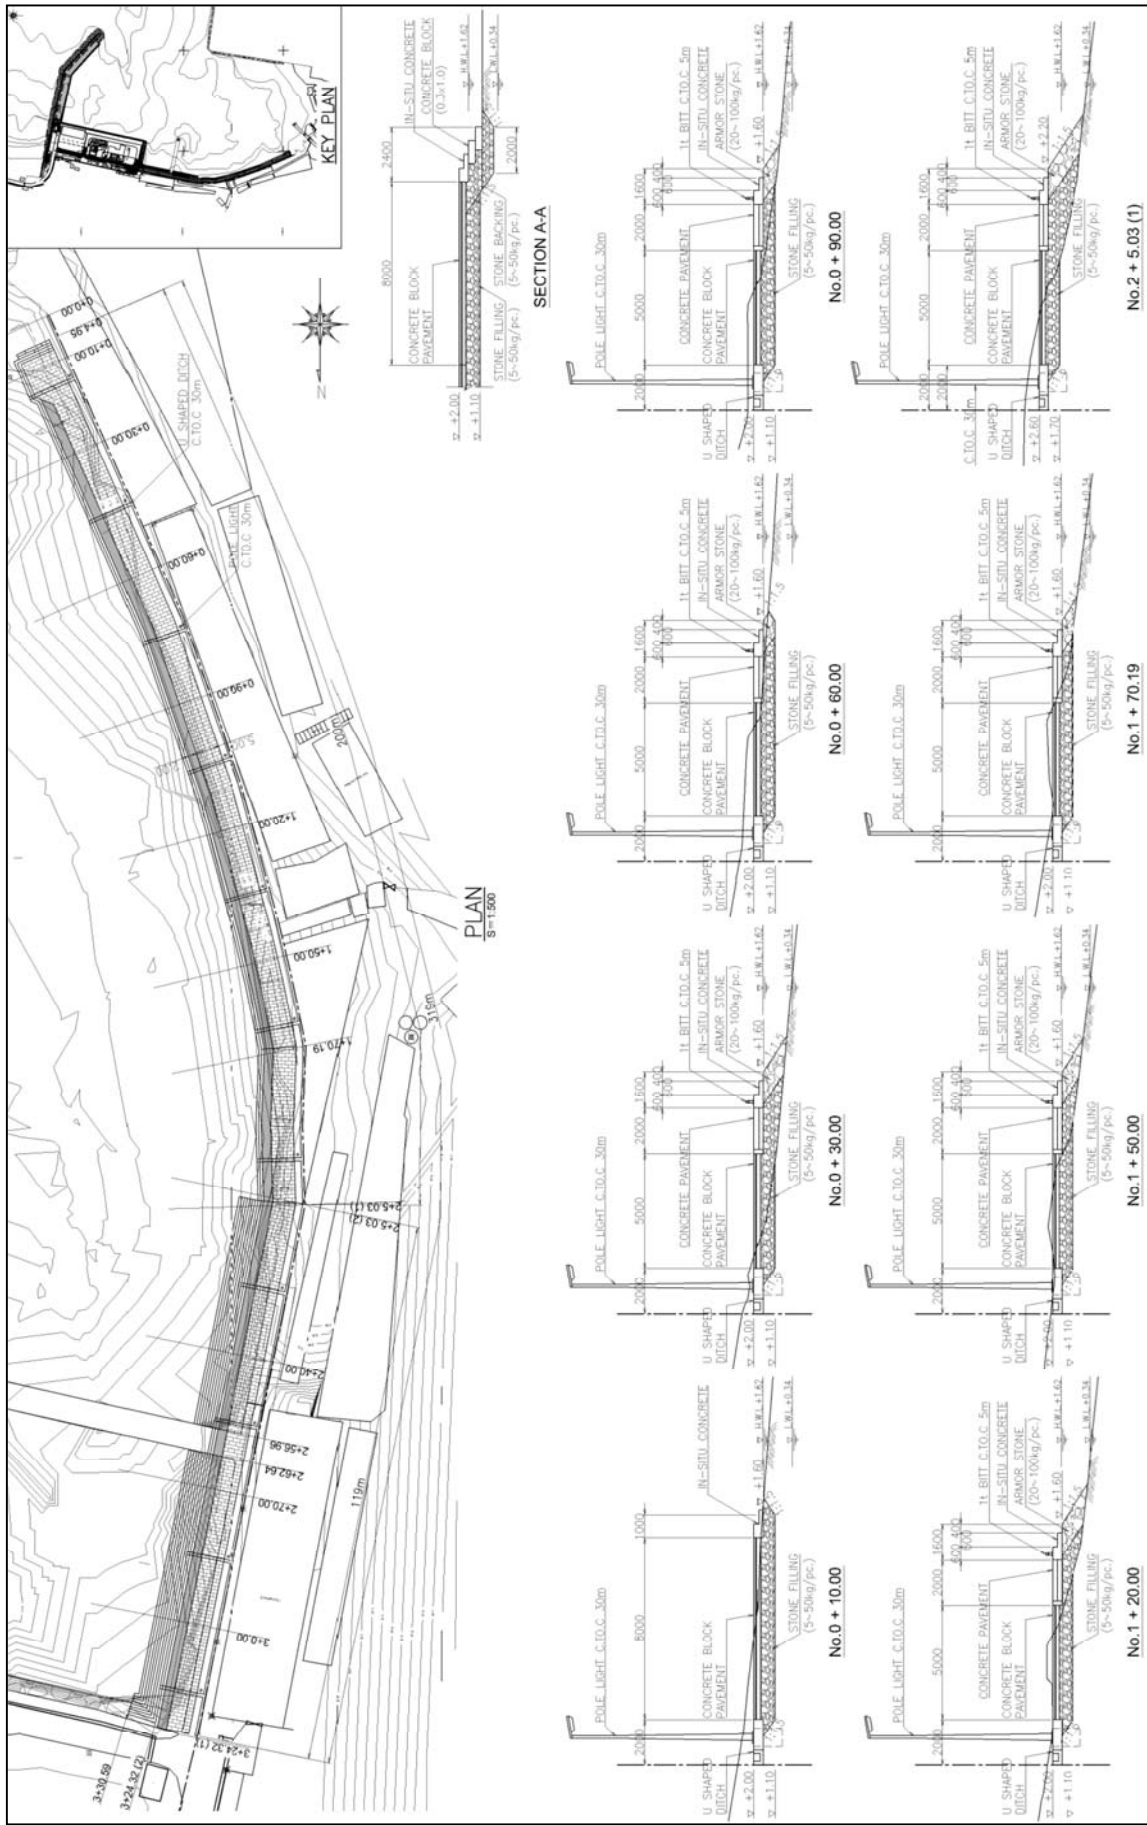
(5) Typical Cross Section of Access Driveway (2)
